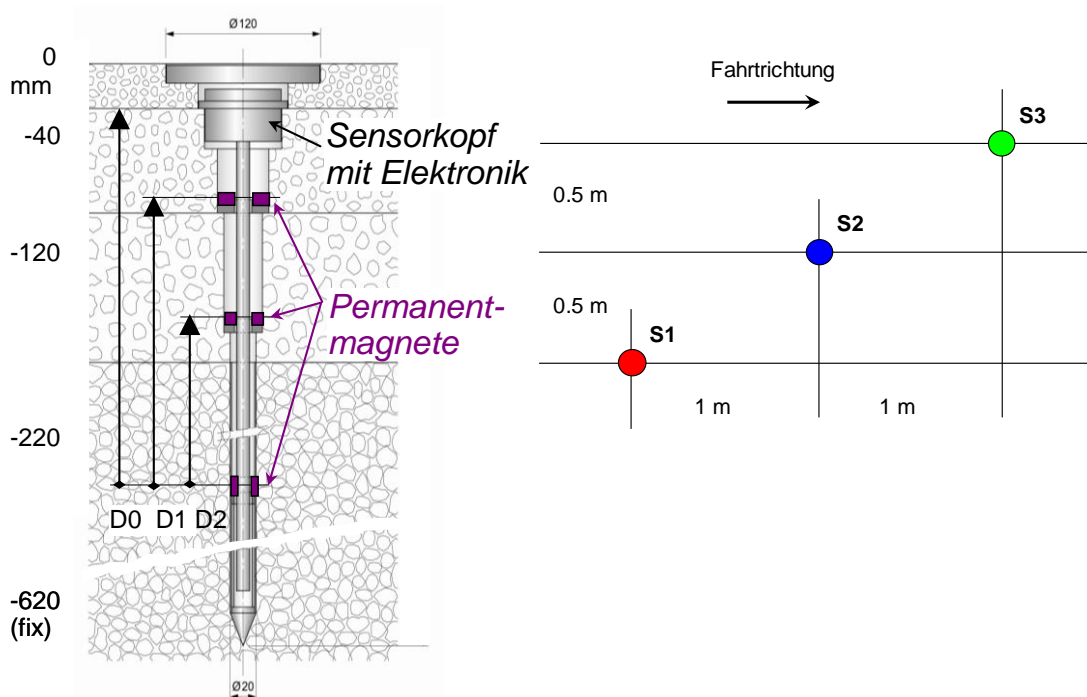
1 Schematic of the sensor installation and positioning on the road
